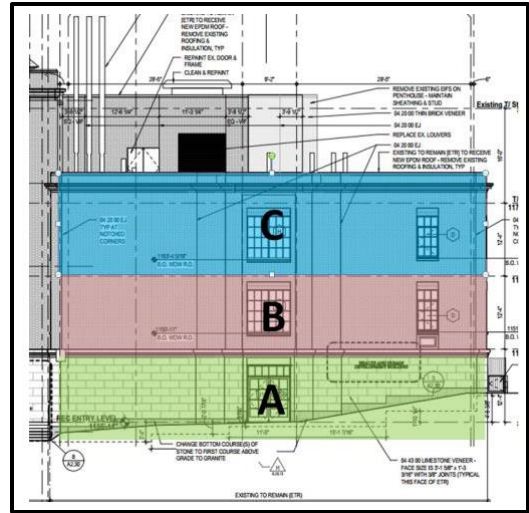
Vertical Sequencing Plan of Existing to Remain Structure
